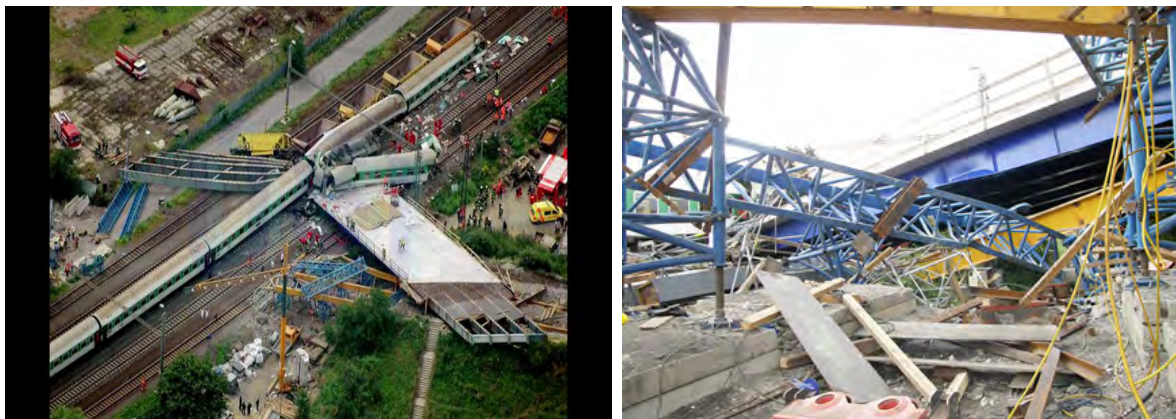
Collapsed bridge superstructure and details of damaged structural parts of falsework
